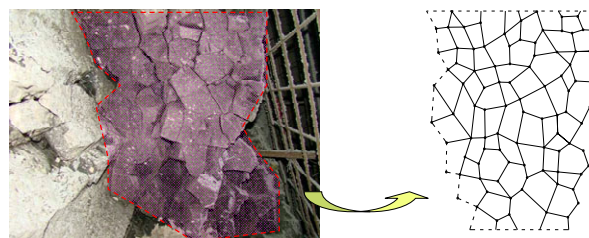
Exposed columnar jointed rock mass in diversion tunnels
